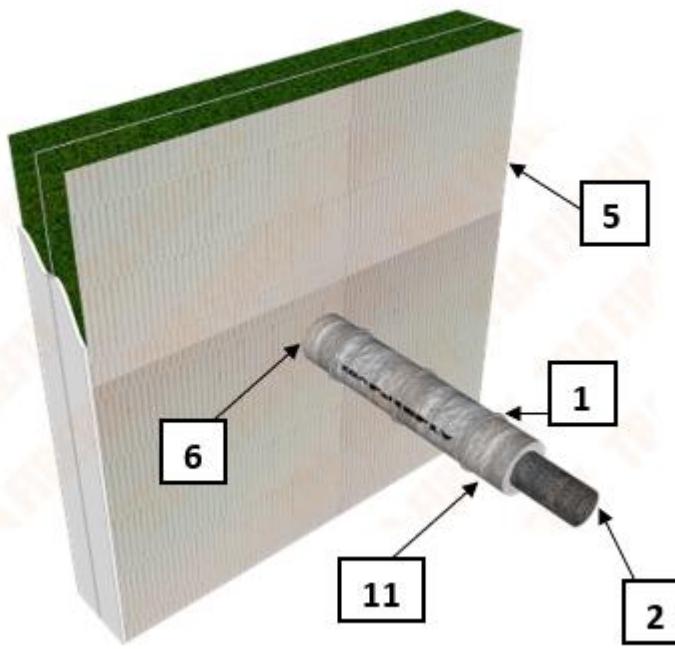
8mm up to 48.6mm OD Steel Pipe through vertical double TBA Firefly™ Intubatt Seal
